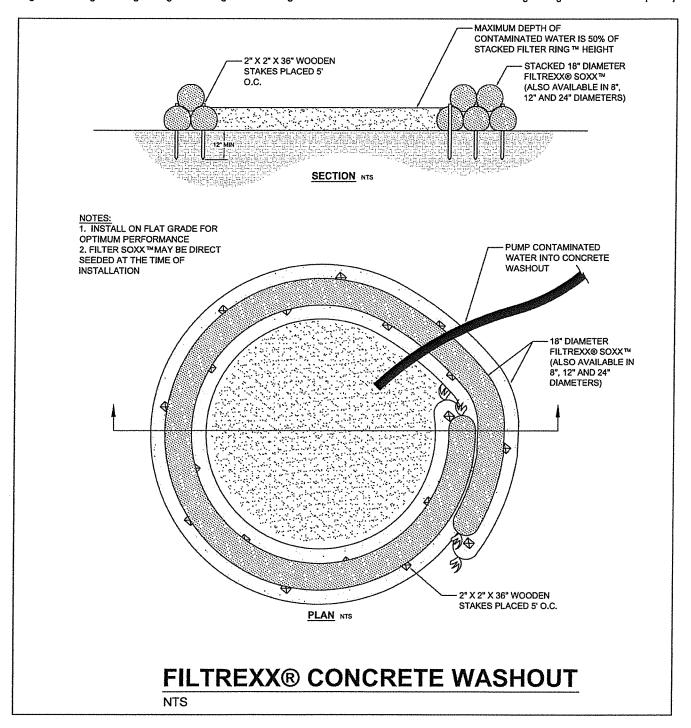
Engineering Design Drawing for Stacking Concrete Washout Soxx™ to Increase Design Height & Volume Capacity
